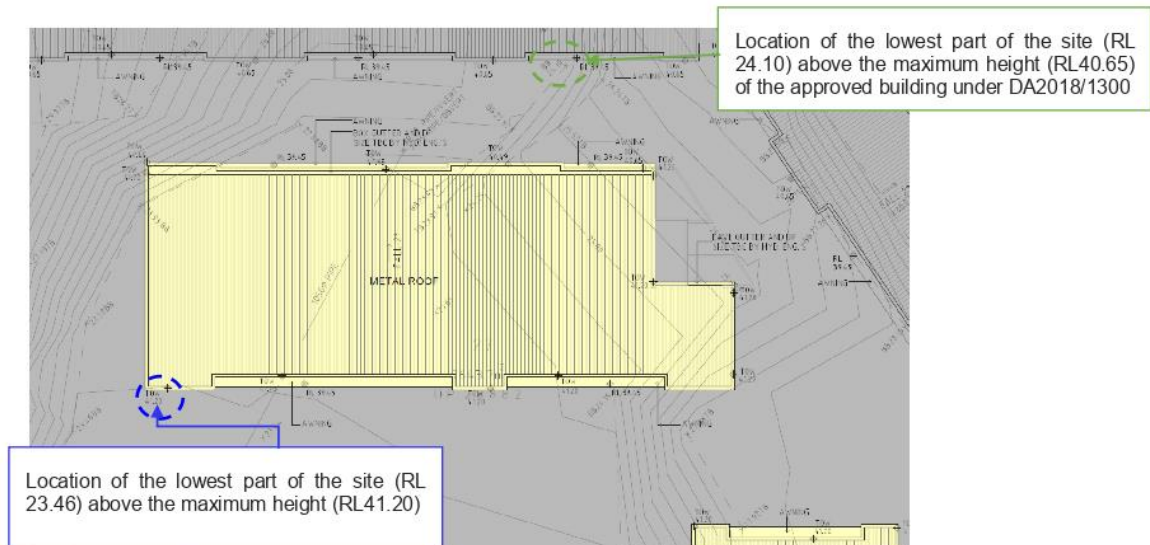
Indication of the maximum building height as measured from ground level 'existing' (Source: Beveridge Williams and PBD Architects).
